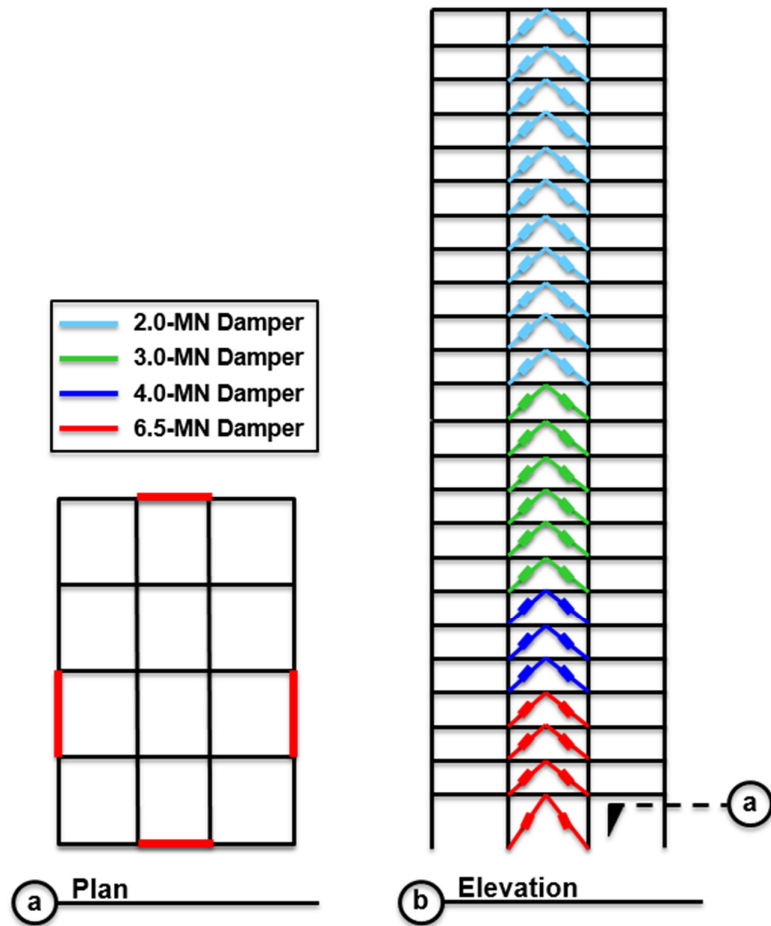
(a) Plan view; and (b) Elevation view of the viscous dampers
